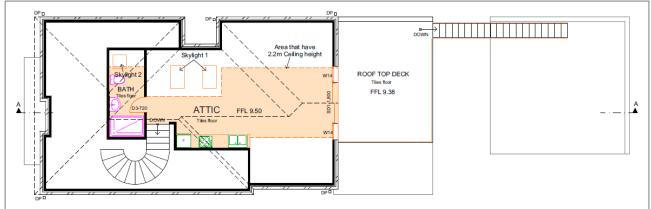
Applicants gross floor area measurements of attic floor (Source: Benyana Building Design)
